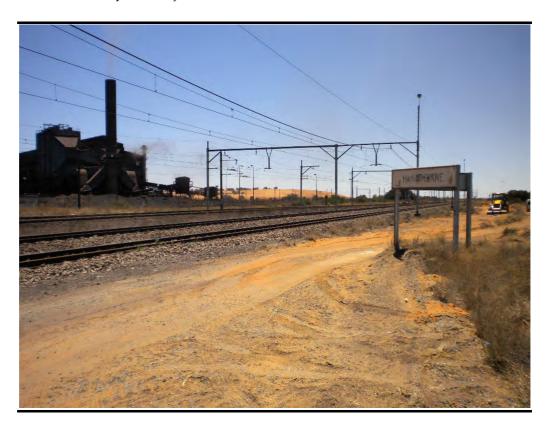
Mamathwane Compilation Yard: Facing North East Along Railway Line at the Northern End of the Project Site
